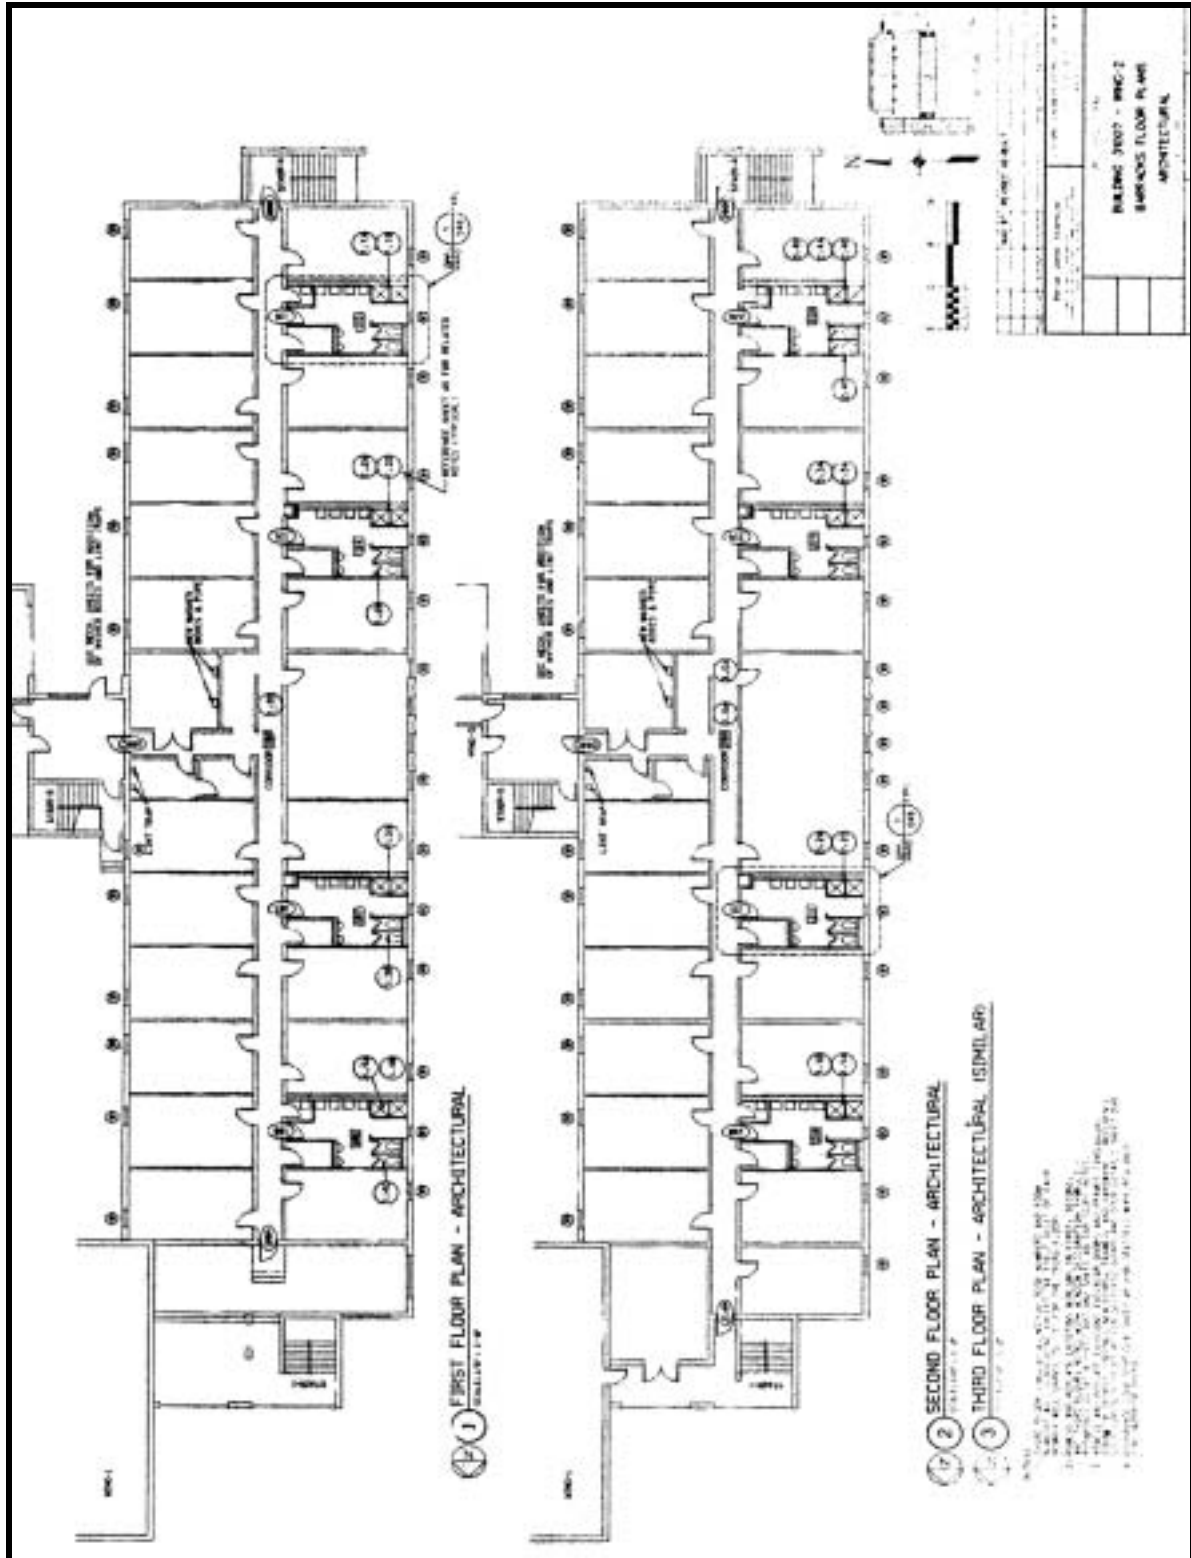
A-style barracks, Bldg. 31007 floor plans, wing 2 (ca. 1971, revised 1997) (Engineering, Ft. Hood).
